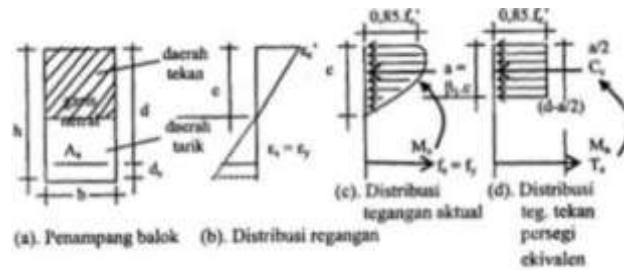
Distribution of Strain and Stress in Single Reinforcement Beams
